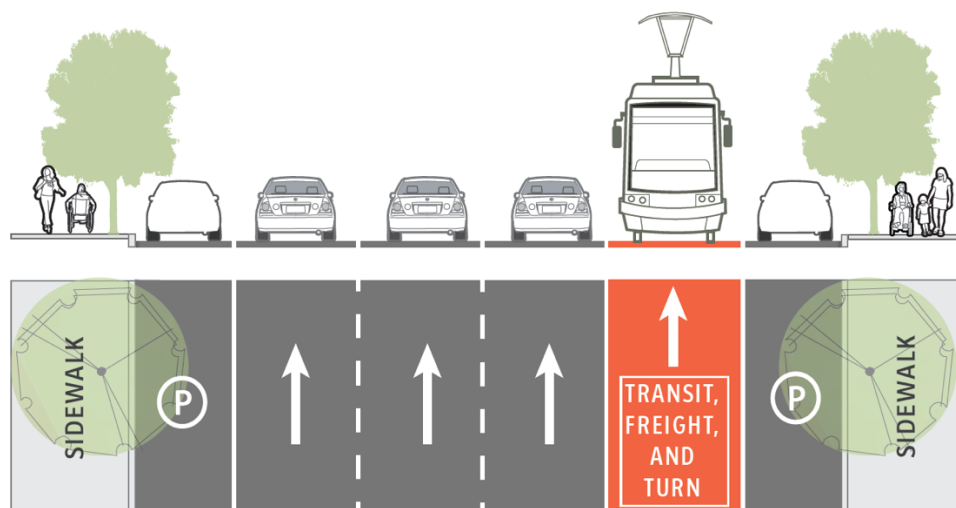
SE Grand Avenue Cross Section (SE Hawthorne Boulevard to I-84) looking north
